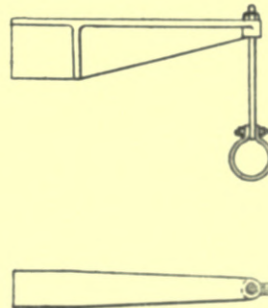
Elevation and Plan of Bracket and Sling for Pipes.
